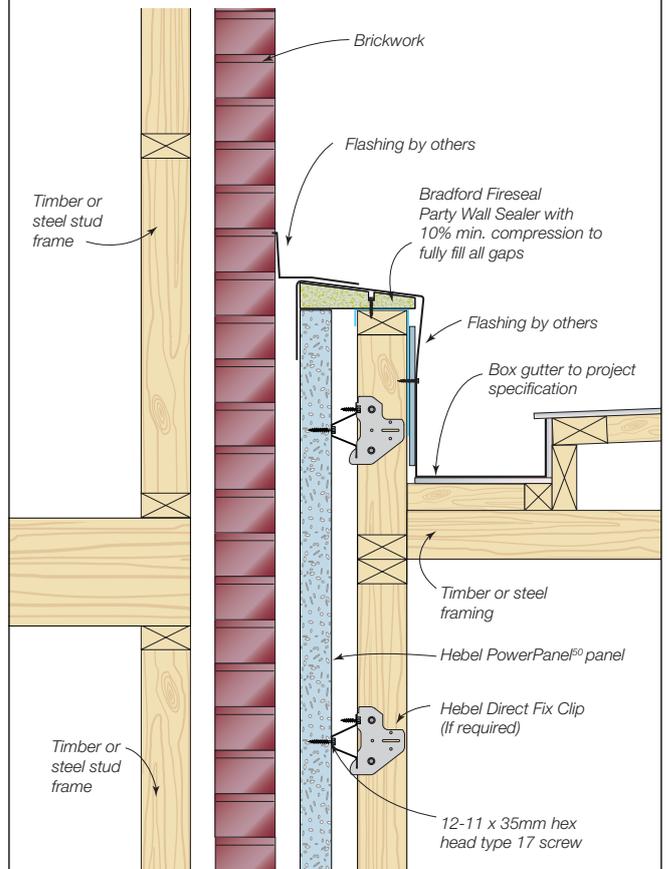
Dual Zero Boundary Wall detail to Hebel External Walls
